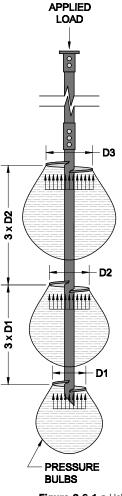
a Helix plate spacing with bulbs of significant stress influence
